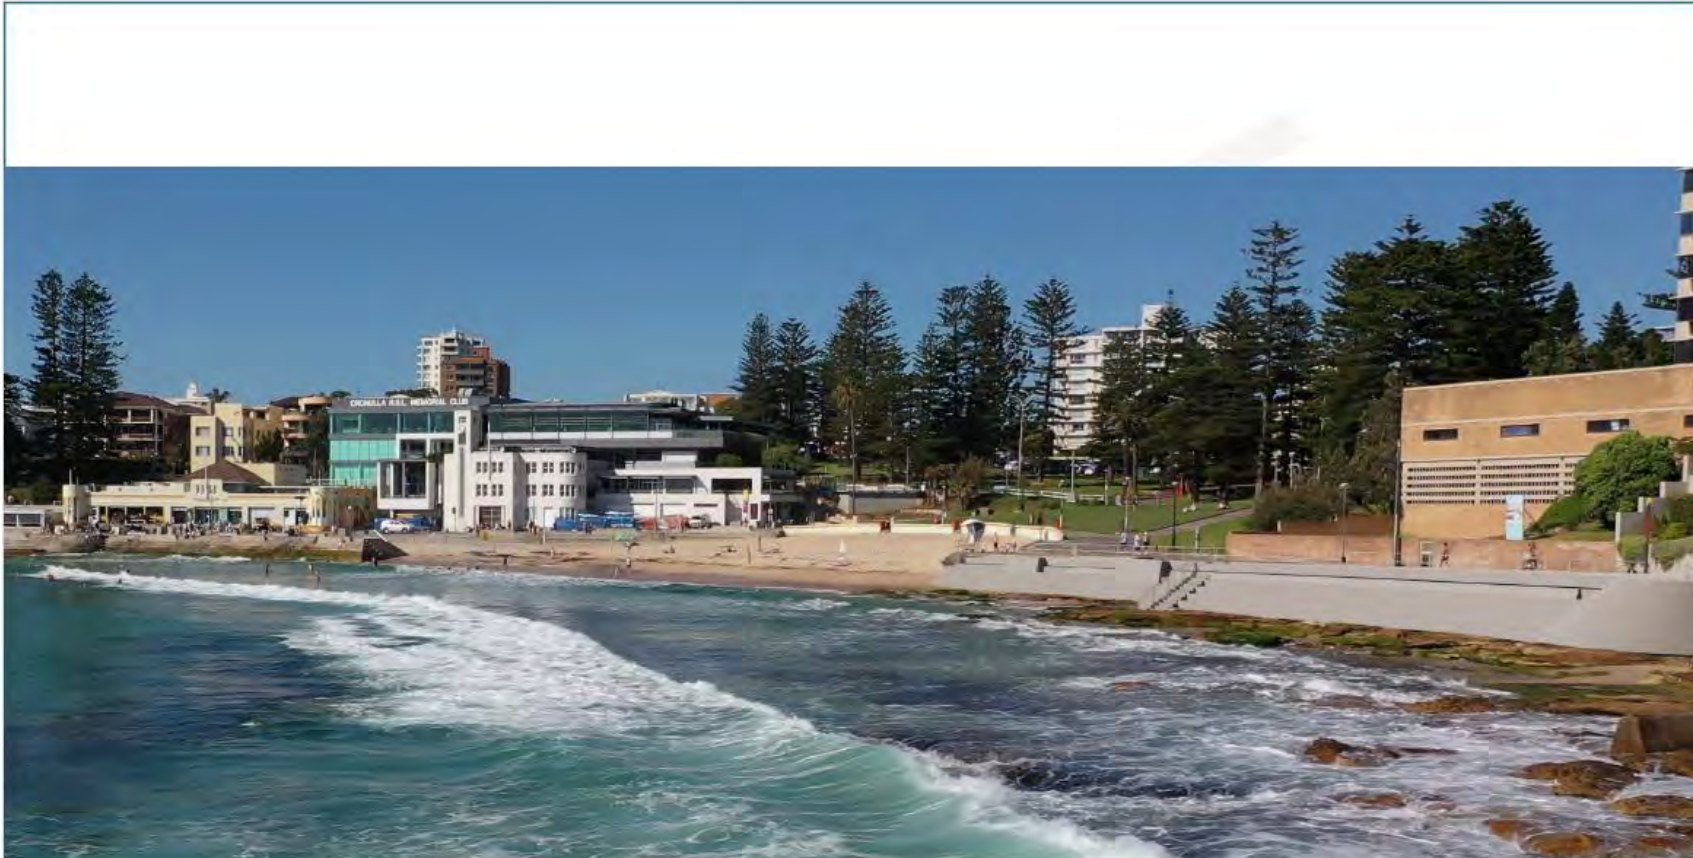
Option 3 - Widen Path with Bleachers, Access Ramps & Maintain Walkway Alignment – South Low Angle
